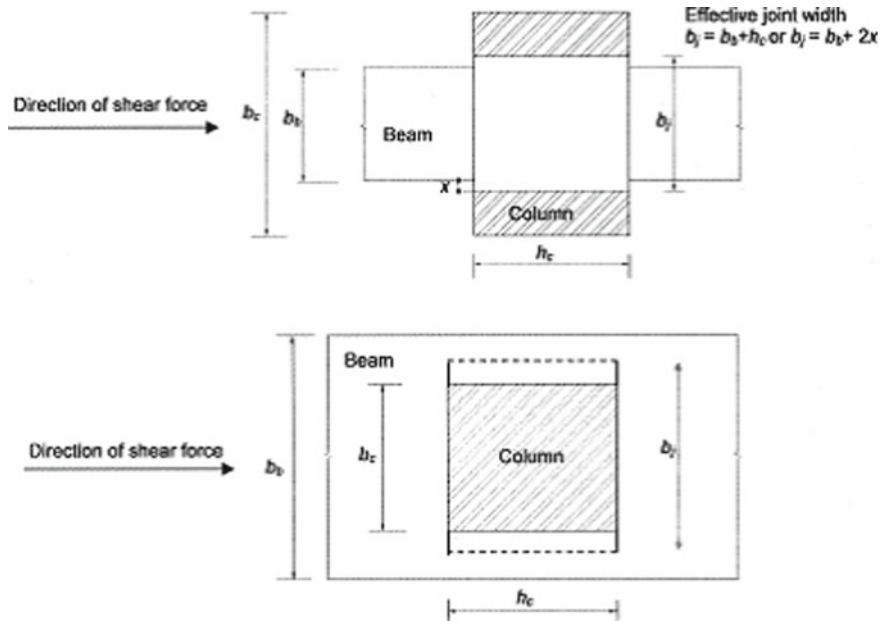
Plan of effective breadth and width of beam-column joint (IS13920:2016) [7]
